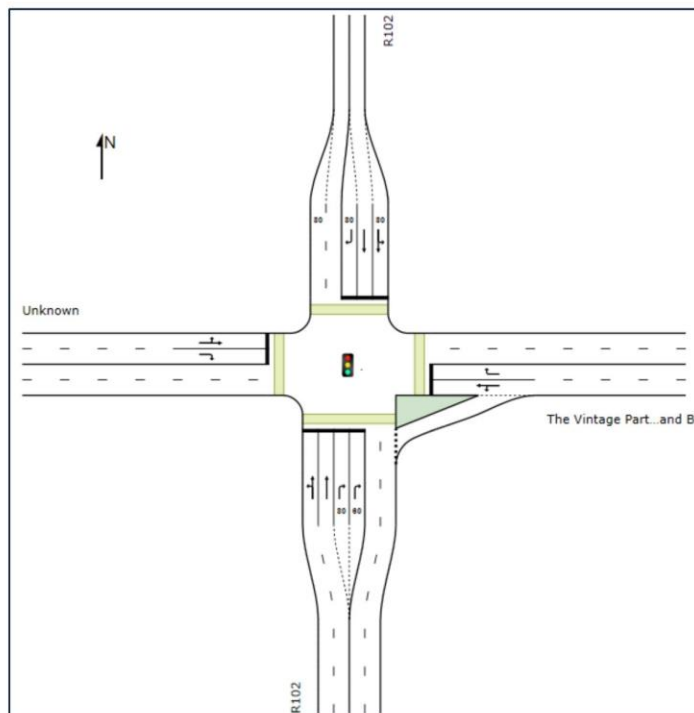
R102 and Planned Development Access: The Vintage Part A and B Proposed Intersection
